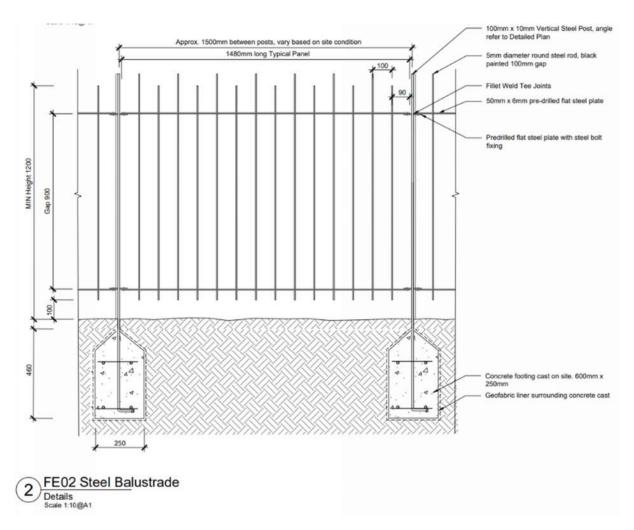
Proposed design for steel balustrade at the top of cascade, excerpt of GbLA plan L5.8, refer GbLA plan L2.5 for the extent. (Source: GbLA, 2023)
